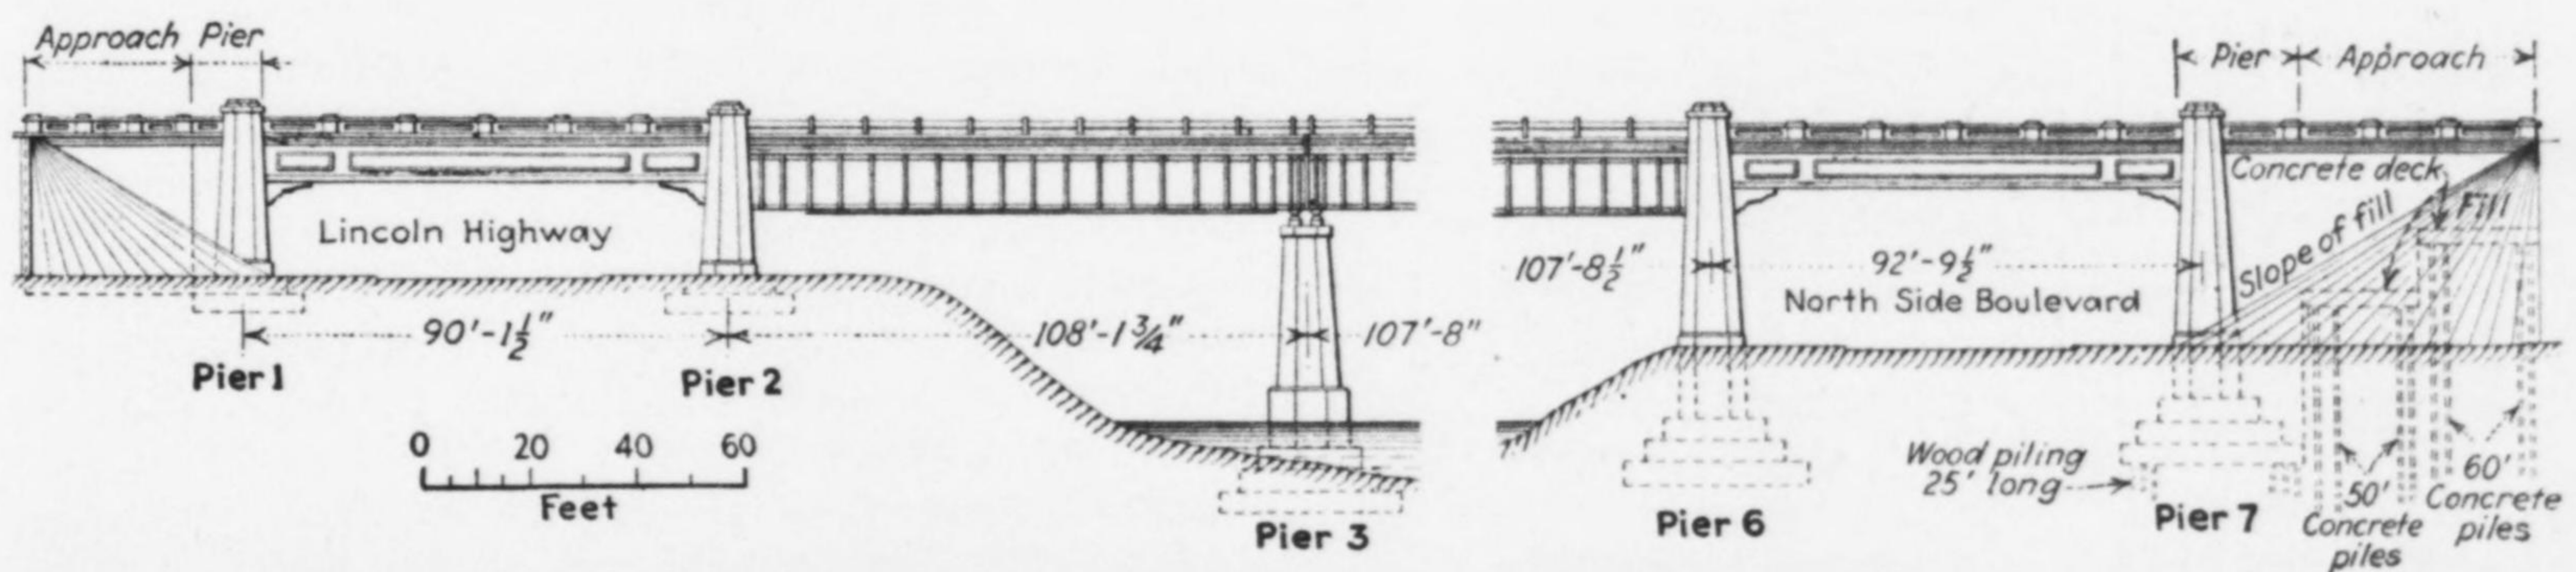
ST. JOSEPH RIVER BRIDGE, GRAND TRUNK WESTERN RAILWAY
